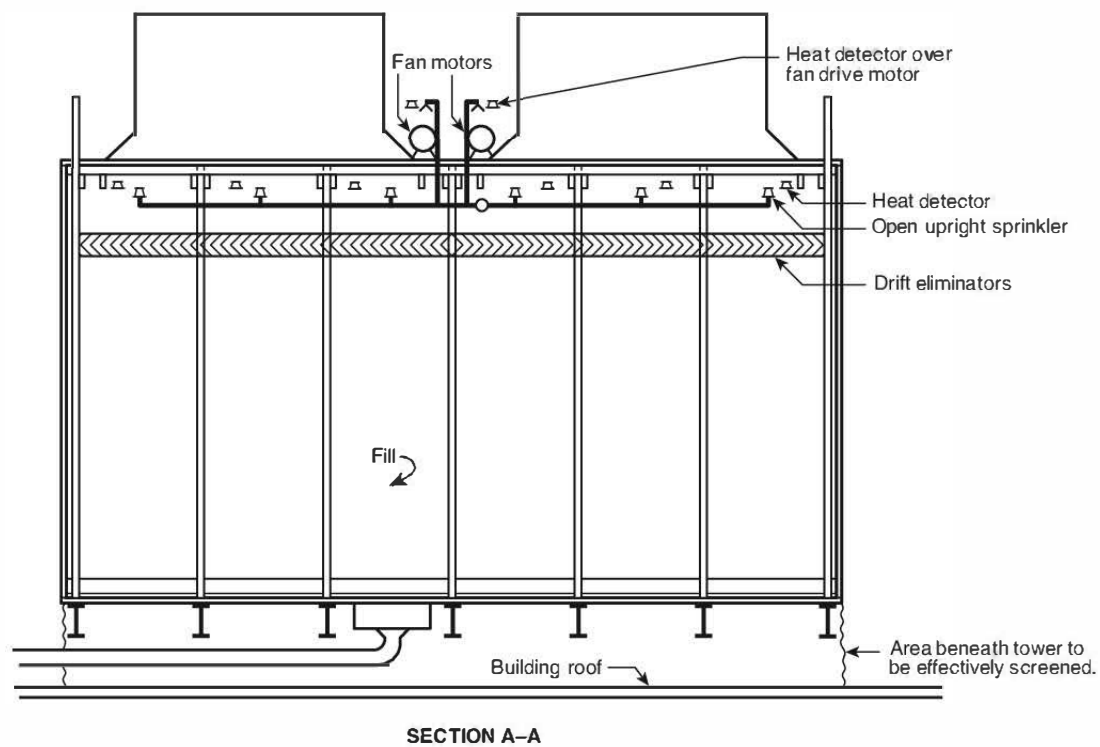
(b) Section View, Typical Deluge Fire Protection Arrangement for Counterflow Towers.
